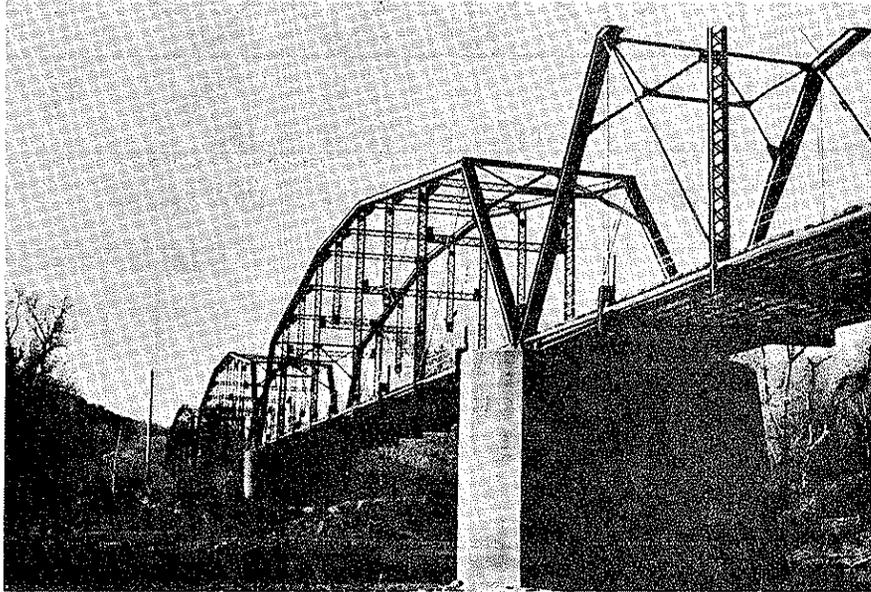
Photograph of Hubby Bridge (Boone County).
